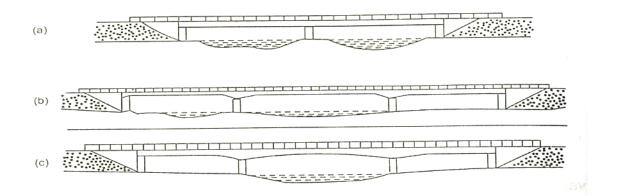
Typical Continuous Reinforced Concrete Bridges
